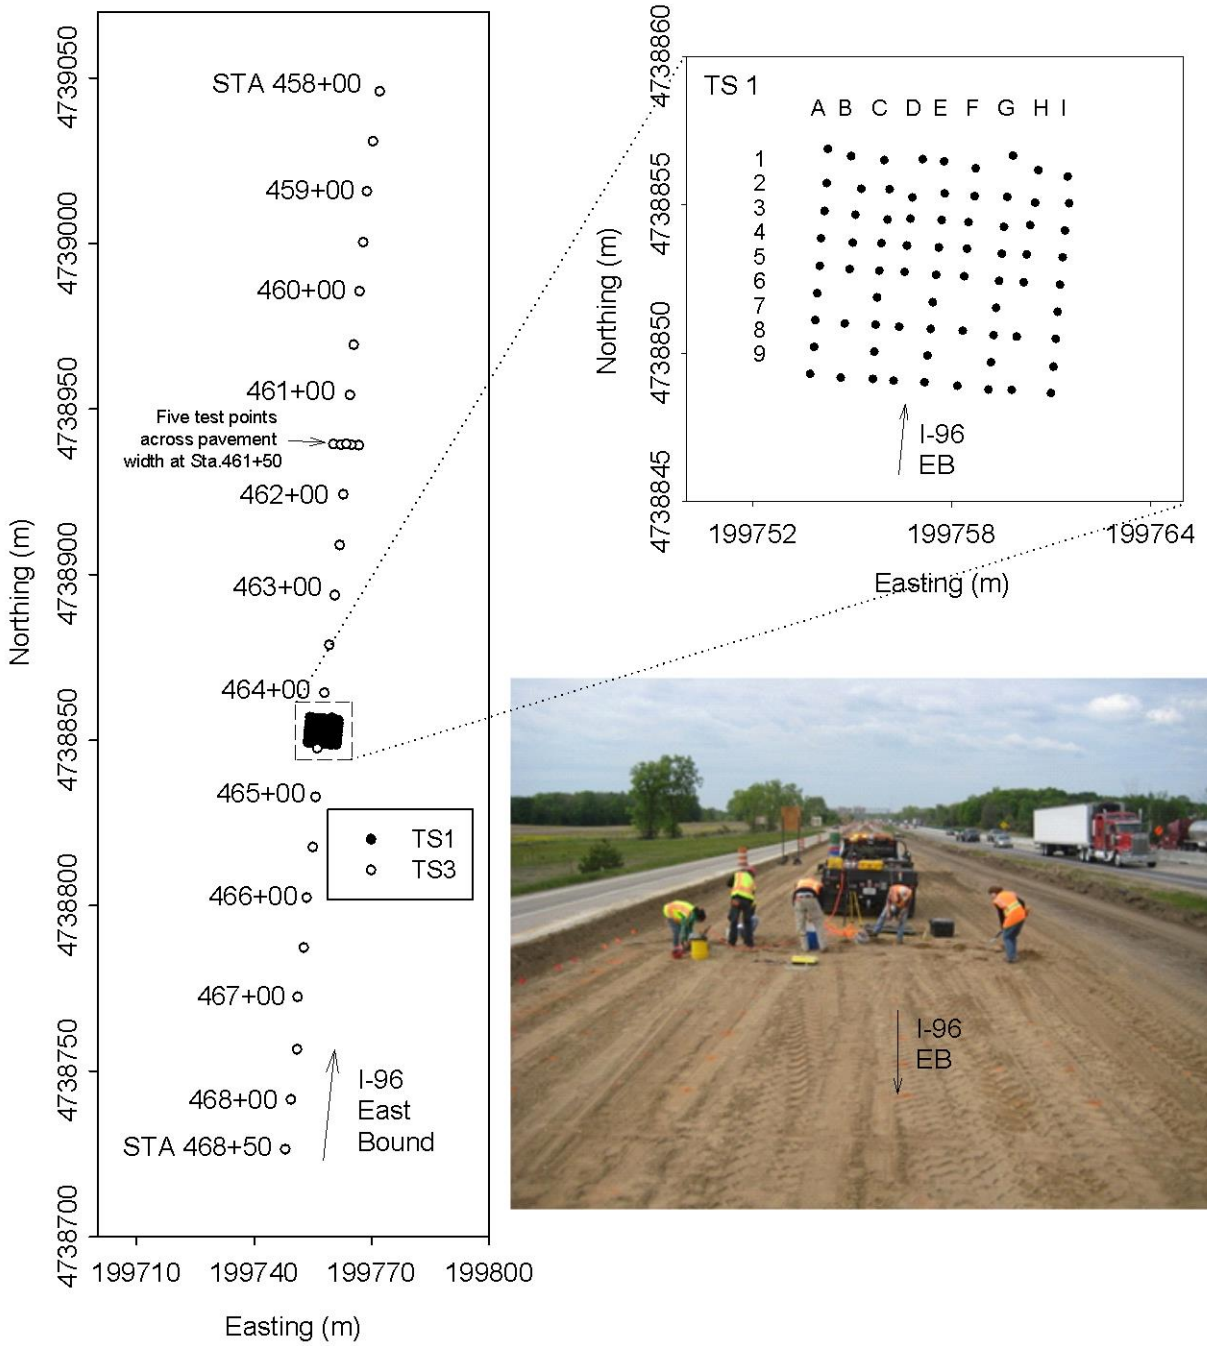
MI I-96 TS1/TS3: Plan view of in situ test locations (left), detailed plan layout (top right), and image showing test locations
